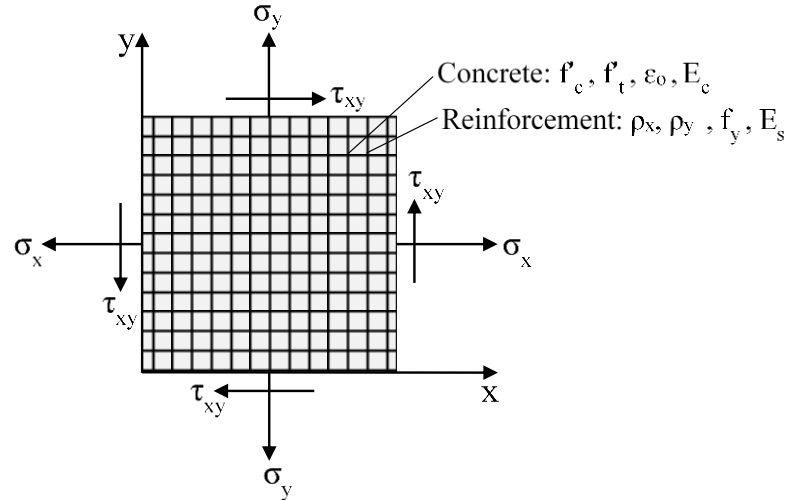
Reinforced concrete membrane element subject to in-plane stresses (Wong et al., 2013)
